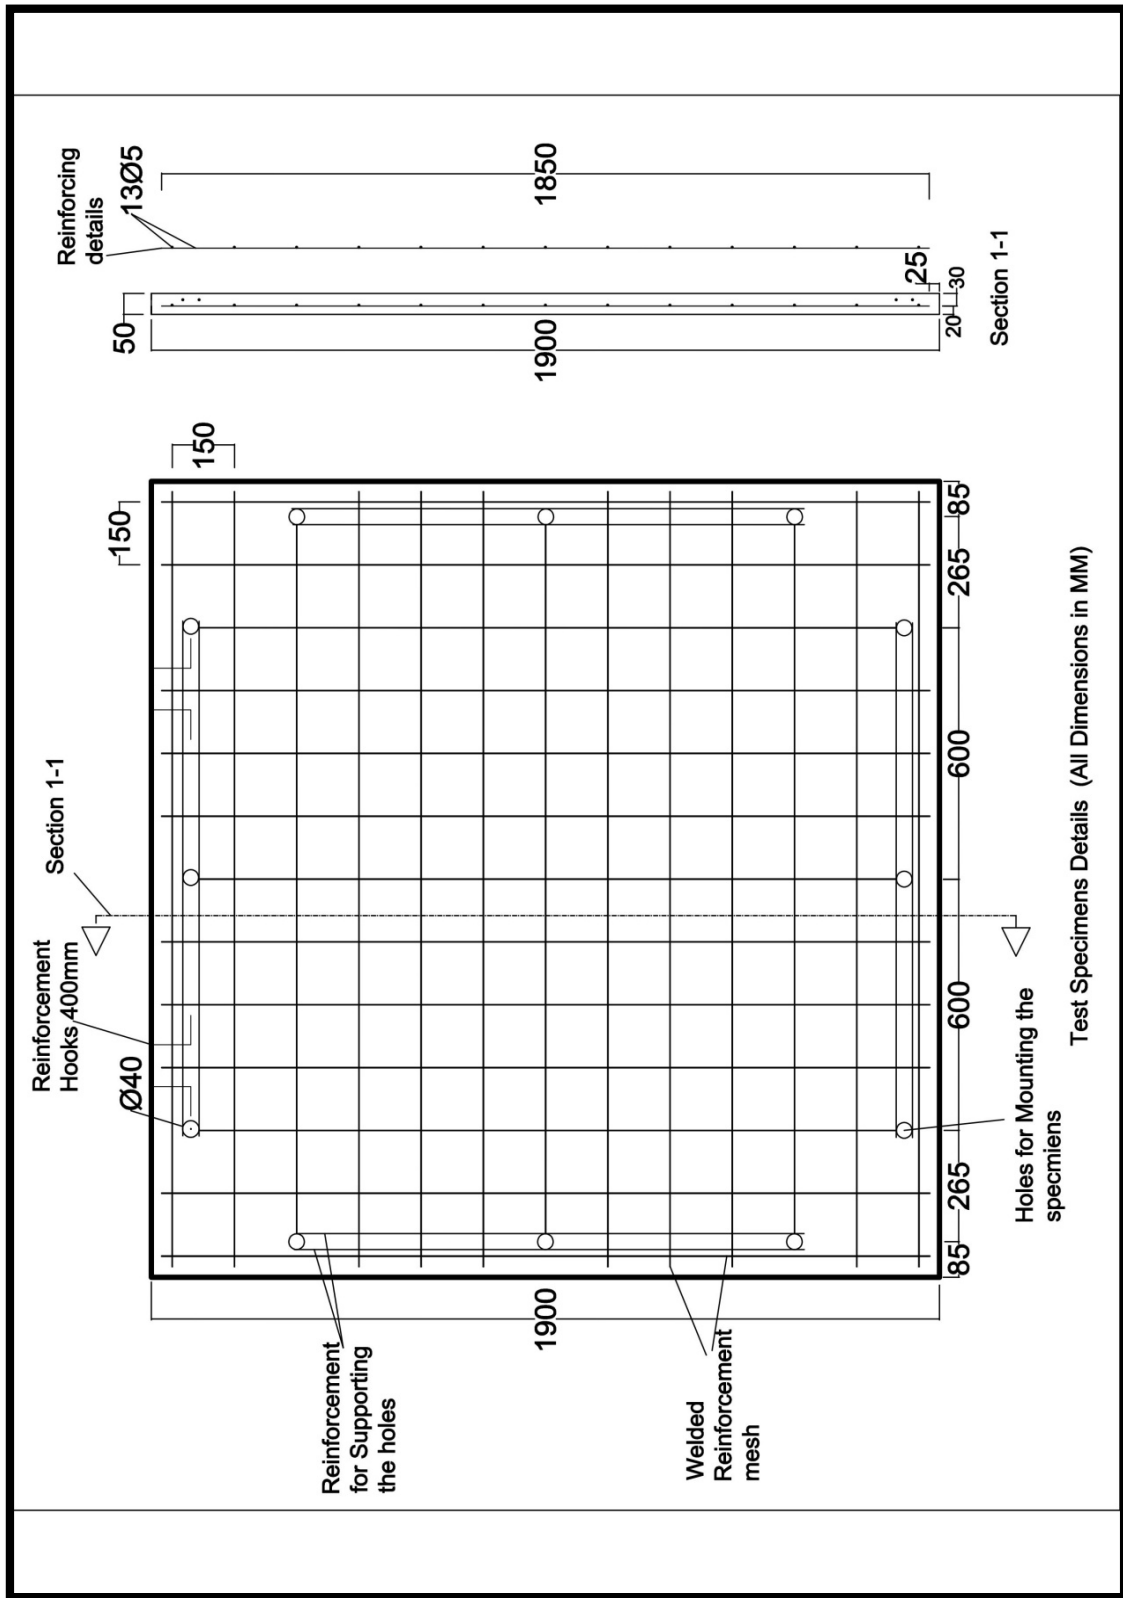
Test Specimen Details (All Dimensions in mm)
